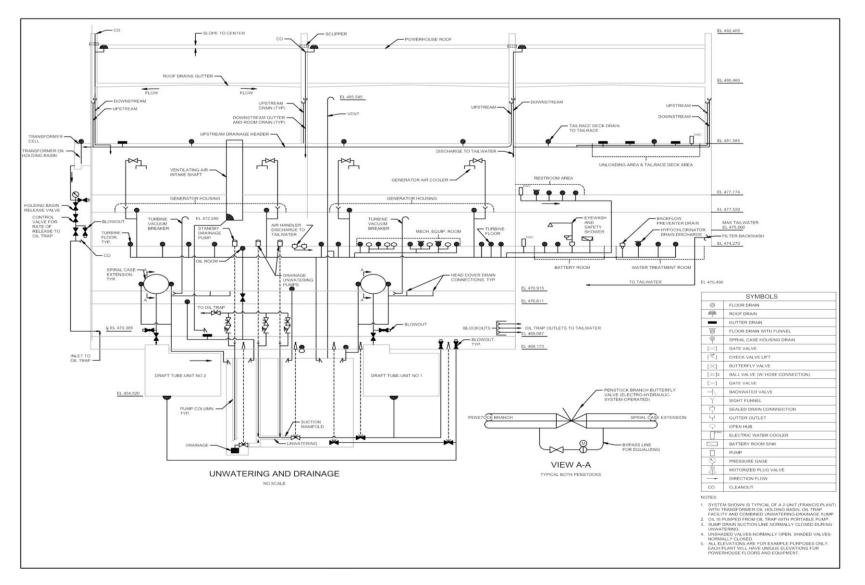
Example unwatering and drainage system for a typical 2-Francis unit plant
